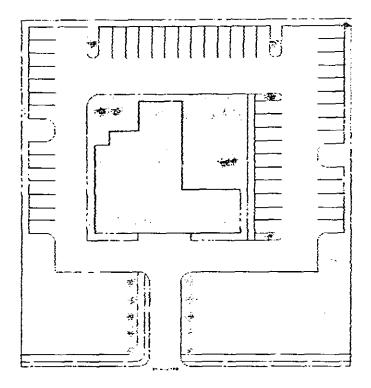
Parking Lot Location and Design Criteria (2)(d) of this section.
